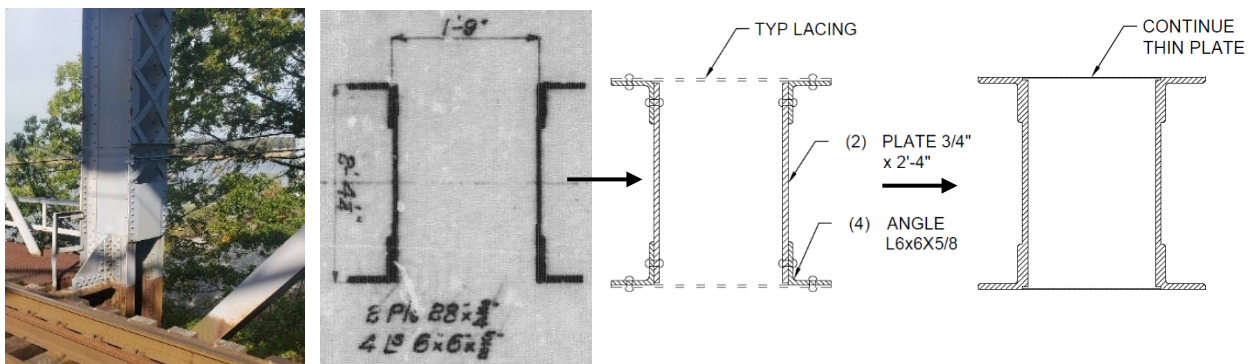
Devon bridge: Vertical post picture, original drawings, gross cross-section, and equivalent cross-section (left to right)
